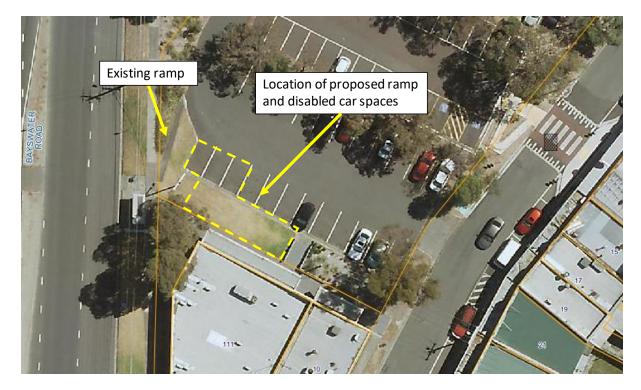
Aerial Photograph showing existing conditions and proposed ramp
